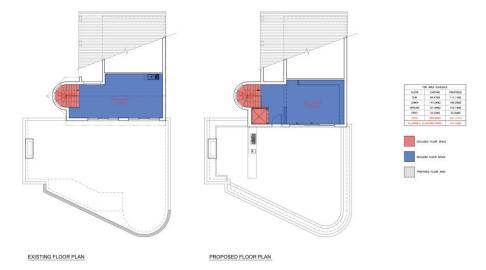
Figure F: First Floor Plans – existing and proposed – showing changes to floor layout and small reduction in GFA
